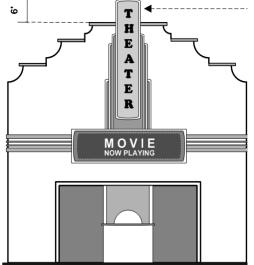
A.2 - Example of Wall Sign on Building Elevation
